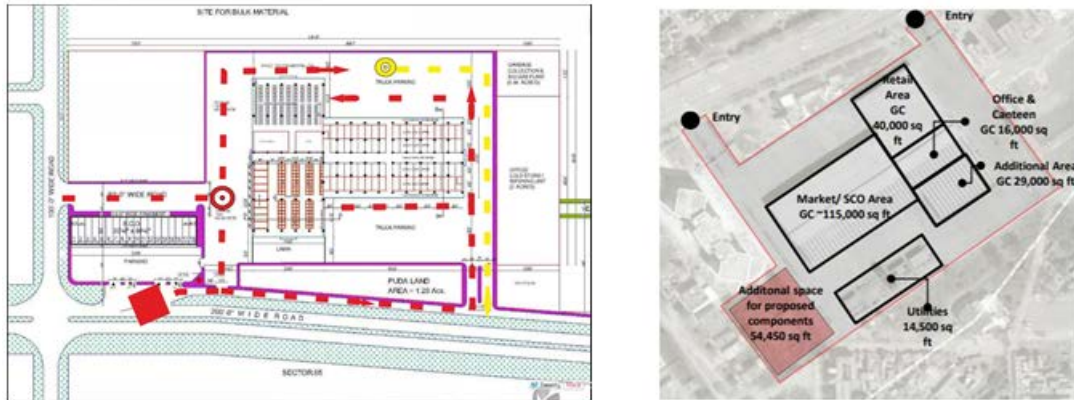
LAYOUT PLAN VEHICULAR MOVEMENT AND ZONING
